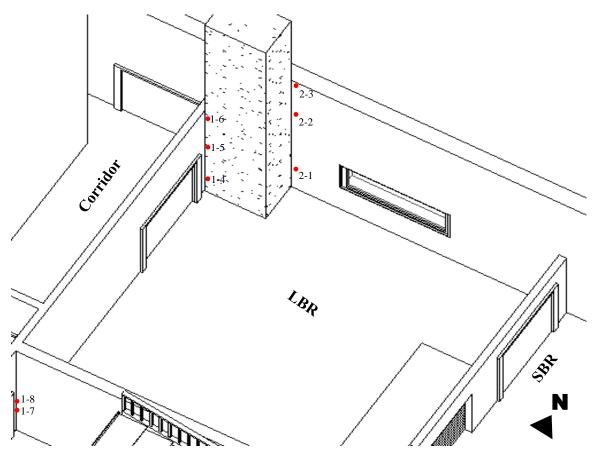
TC in the LBR column gaps and south wall cracks
